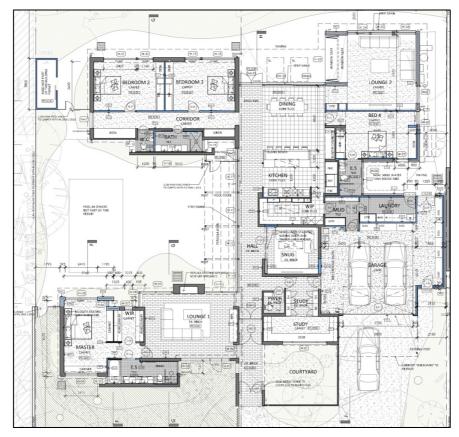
Proposed new envelope, approved as part of Building Permit CBA-U-68108/7986052958252 in November 2022. (Permit drawings provided by owner)
